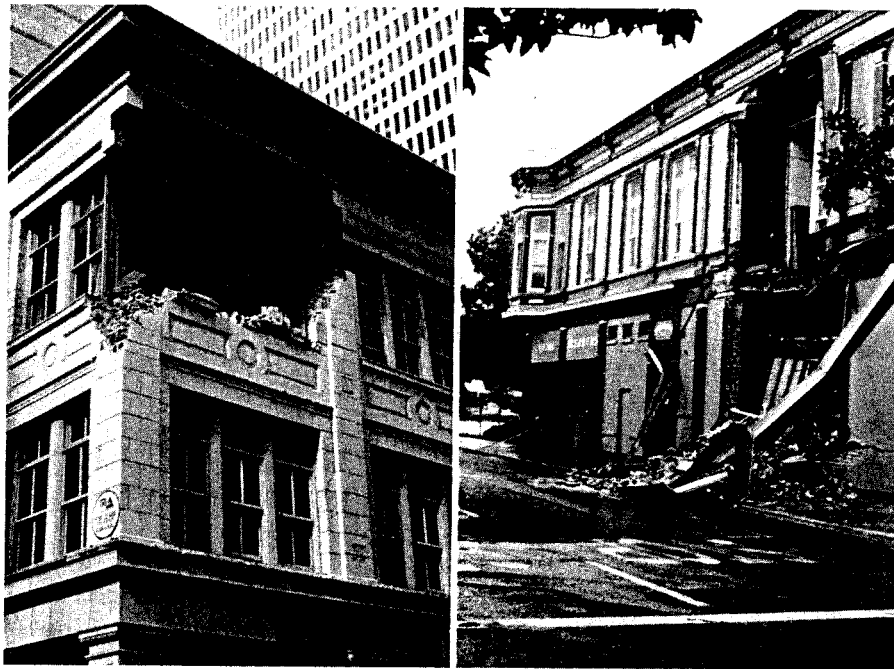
Typical loss of masonry walls (San Francisco and Santa Cruz).
